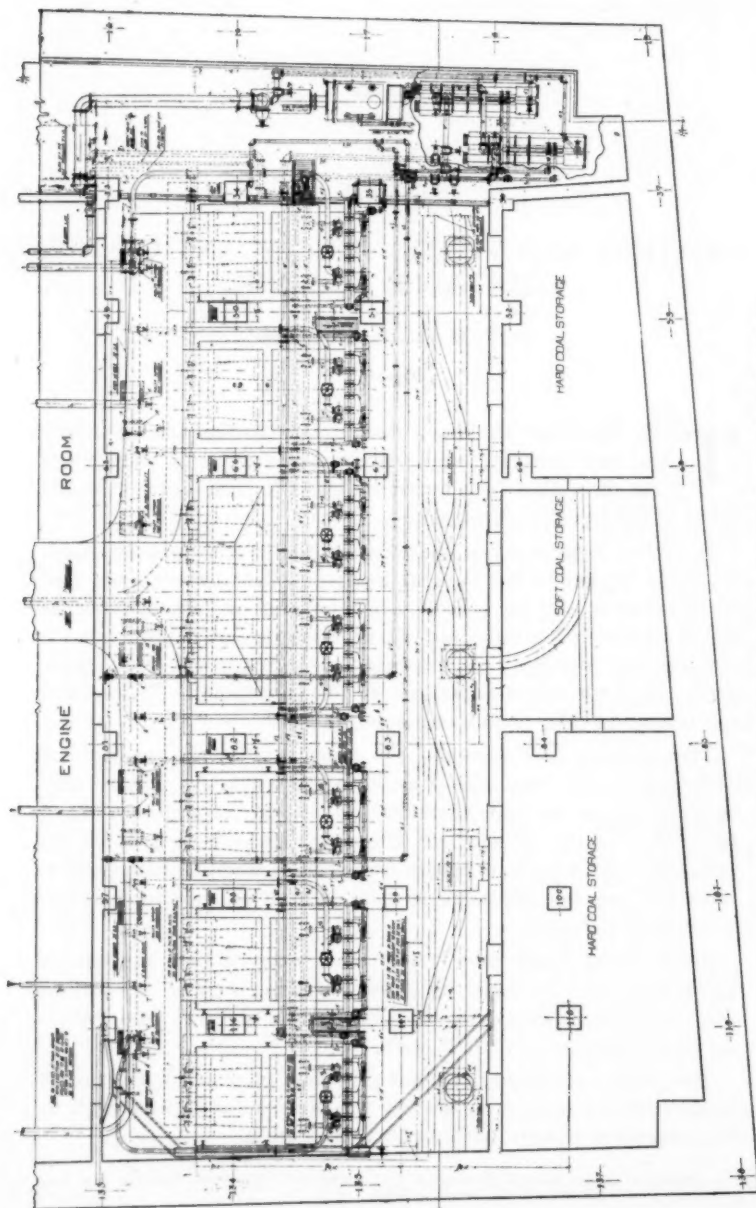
PLAN OF BOILER ROOM OF THE EQUITABLE BUILDING.
